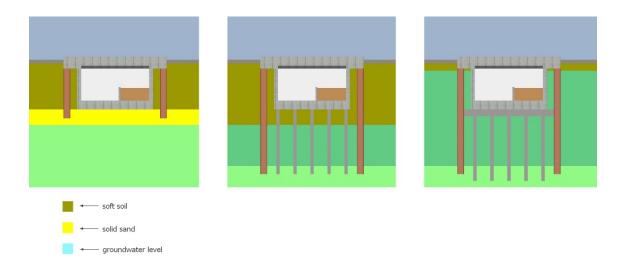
Three foundation types that together are suitable four all soil conditions and groundwater levels (SketchUp).
